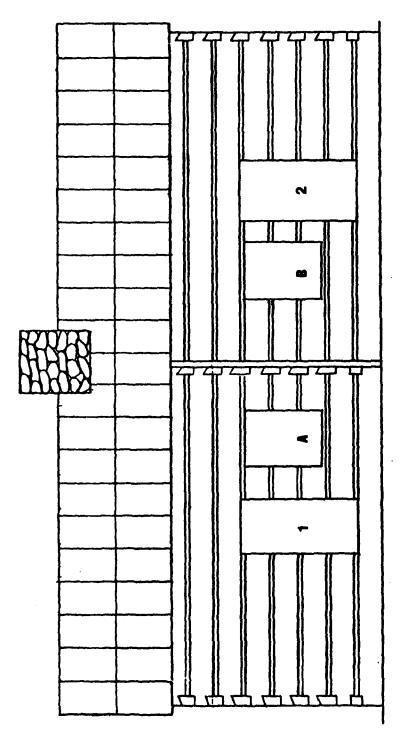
Hubert and Harley Fleming dwelling. Line drawing of facade. Note use of half dovetail construction in the crib at left while that at right uses both mortise and tenon and half dovetail construction.
